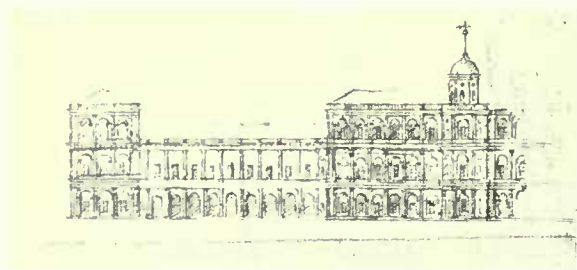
PRELIMINARY SKETCH FOR HALF THE WEST ELEVATION OF FIG. 7, BY JOHN WEBB
